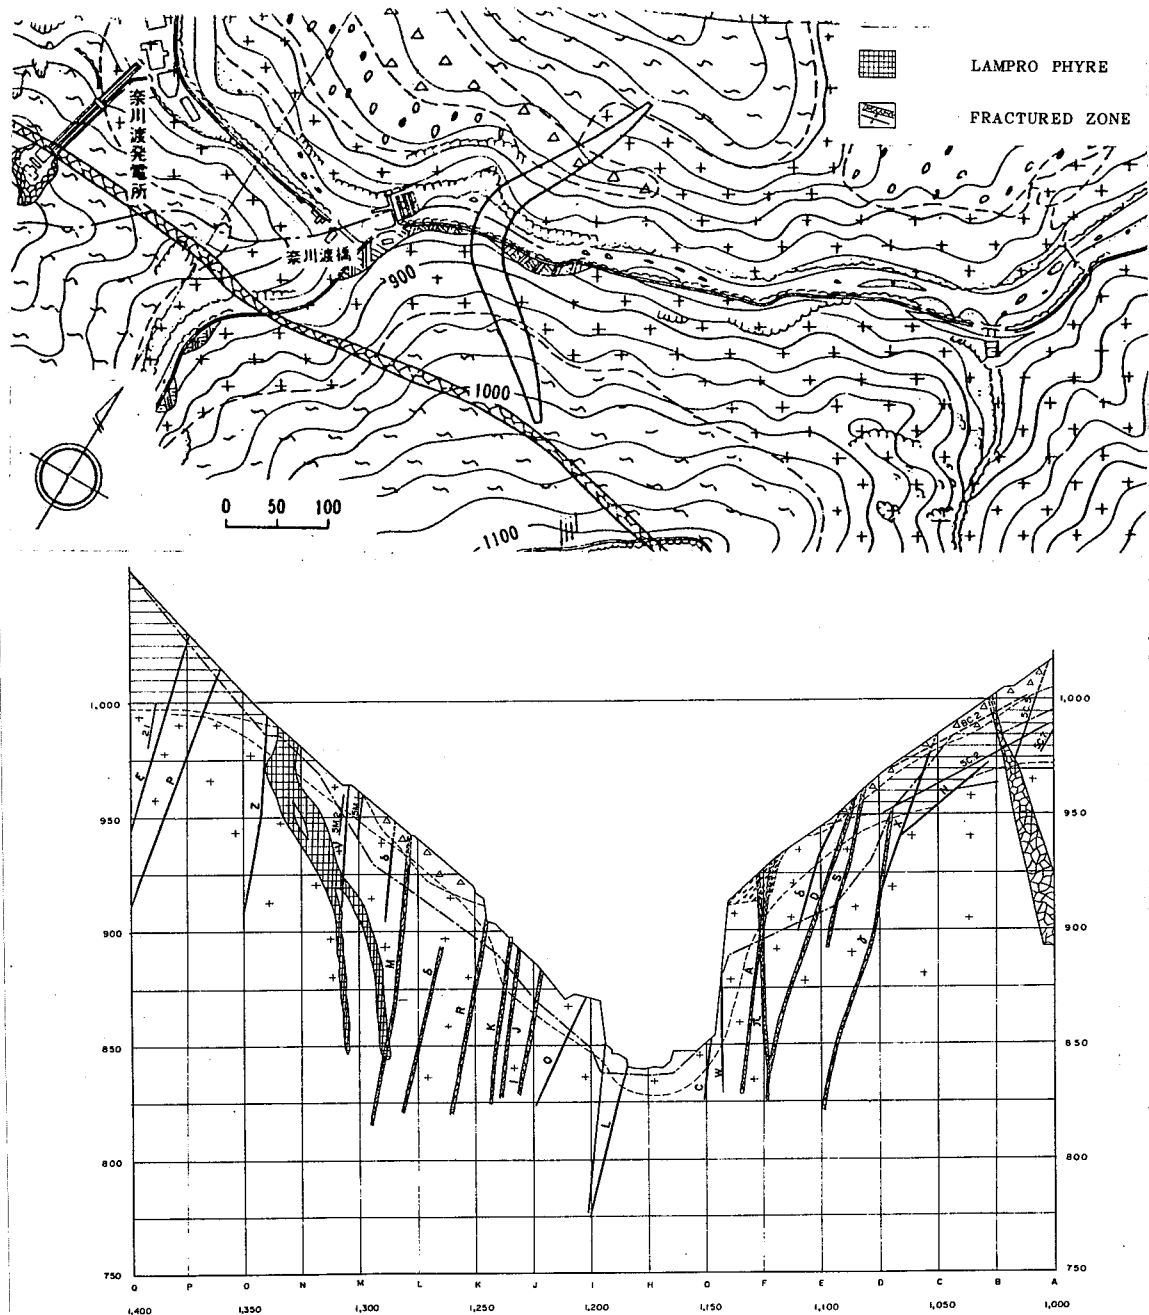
General geologic plan and representative cross-section of the dam foundation
